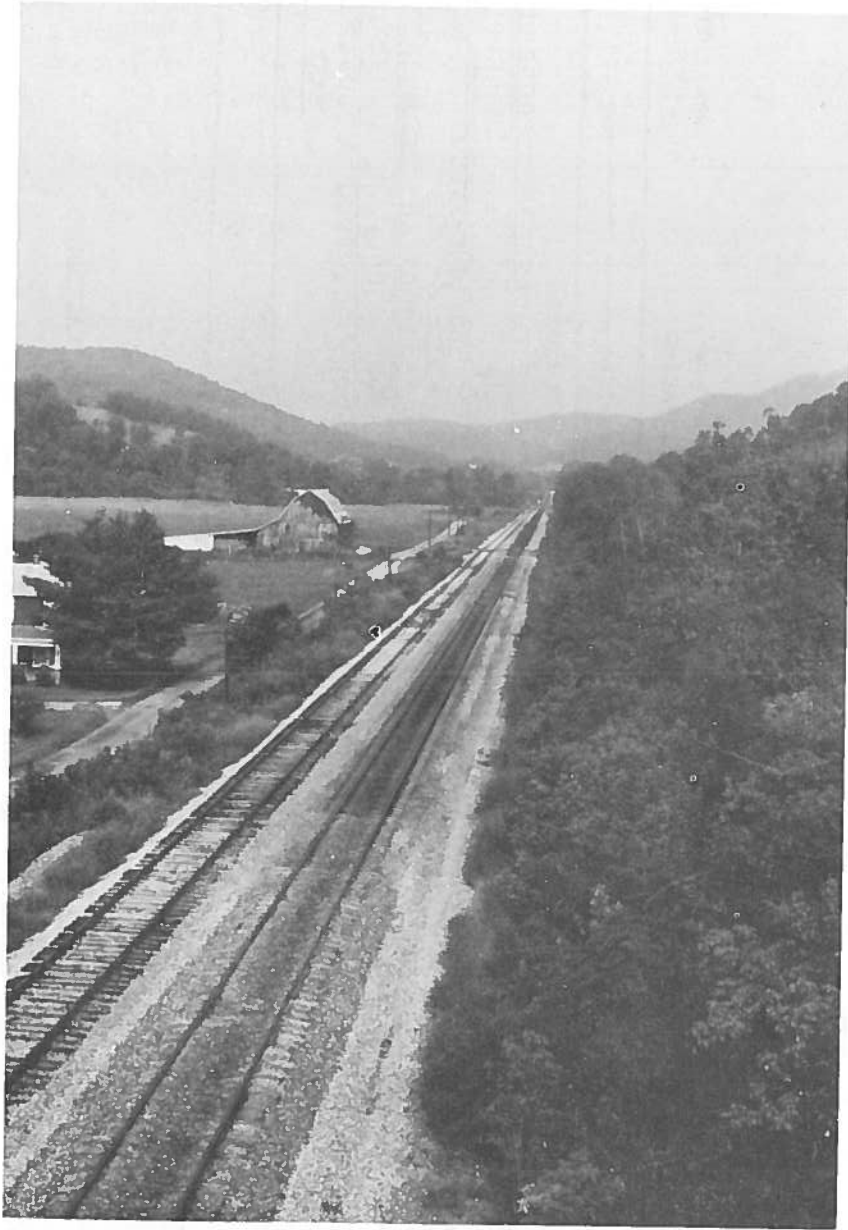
N&W CONCRETE TIE TEST SITE, NEAR ROANOKE, VA., LOOKING WEST
